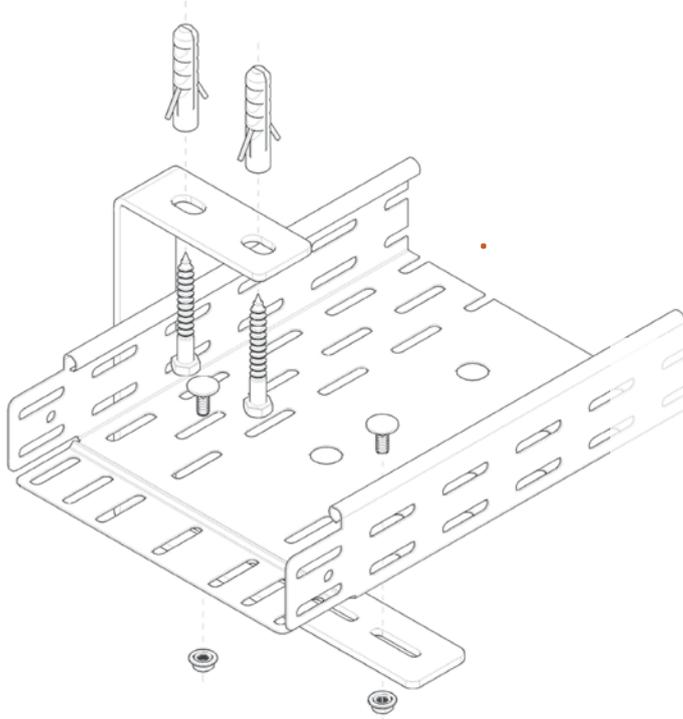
Example of the installation of the cable tray onto the ceiling with the NKP-VNU bracket
